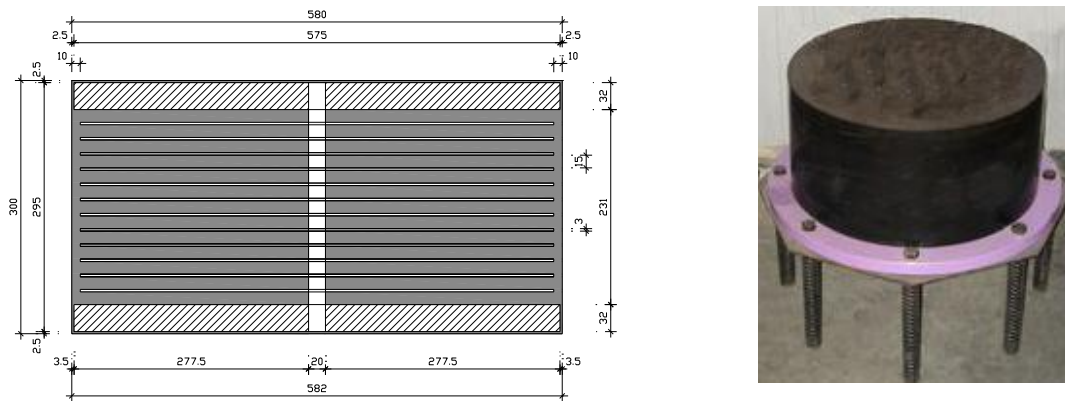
Geometrical dimensions and the view of the manufactured large-size bearing (seismic isolator) designed for retrofitting of the AAWC building.
